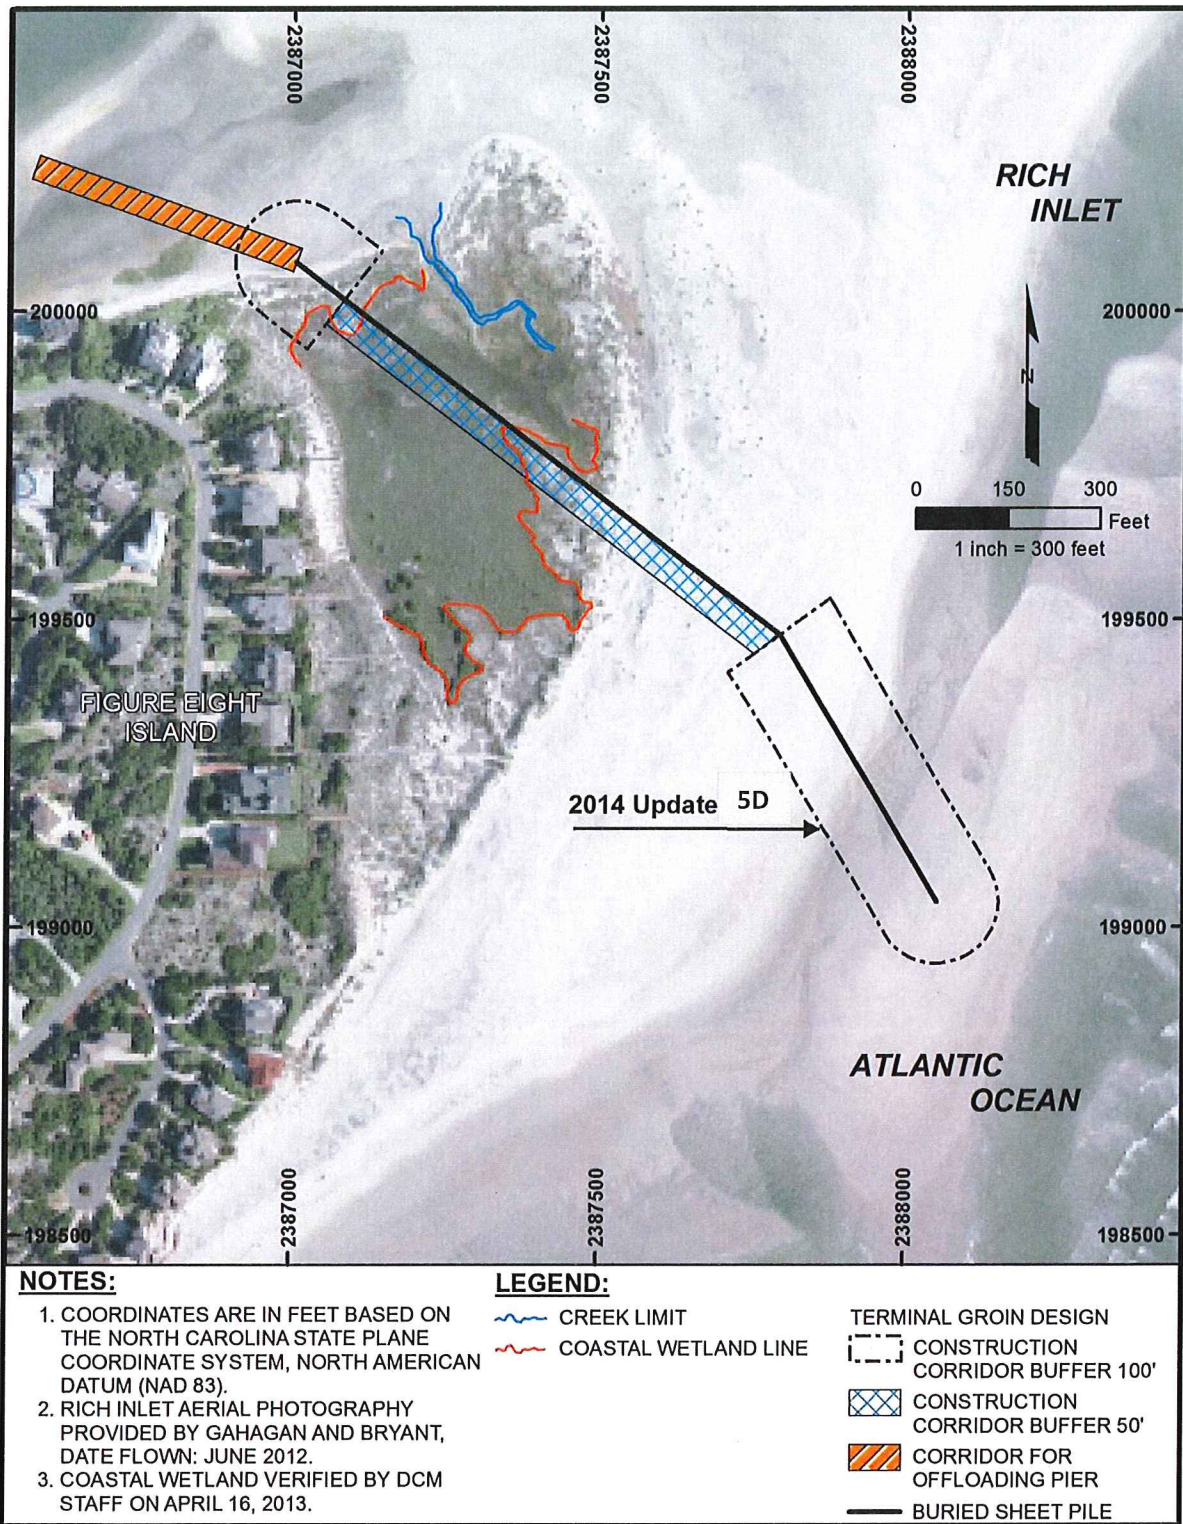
Footprint of the terminal groin, construction corridor, and offloading pier for Alternative 5D.
